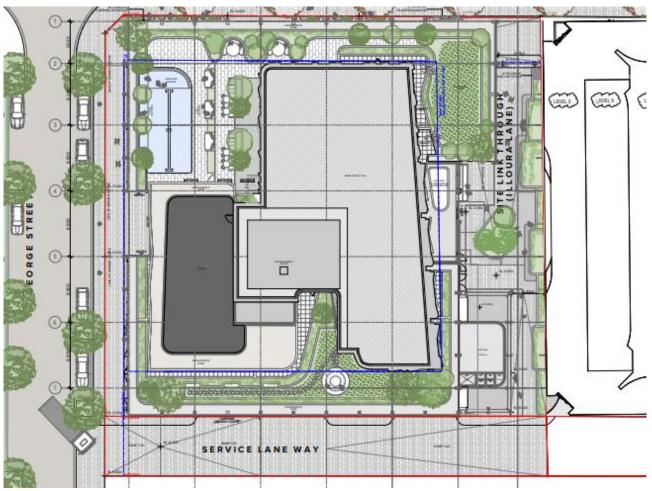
Site plan, 28 Elizabeth Street, Liverpool.
